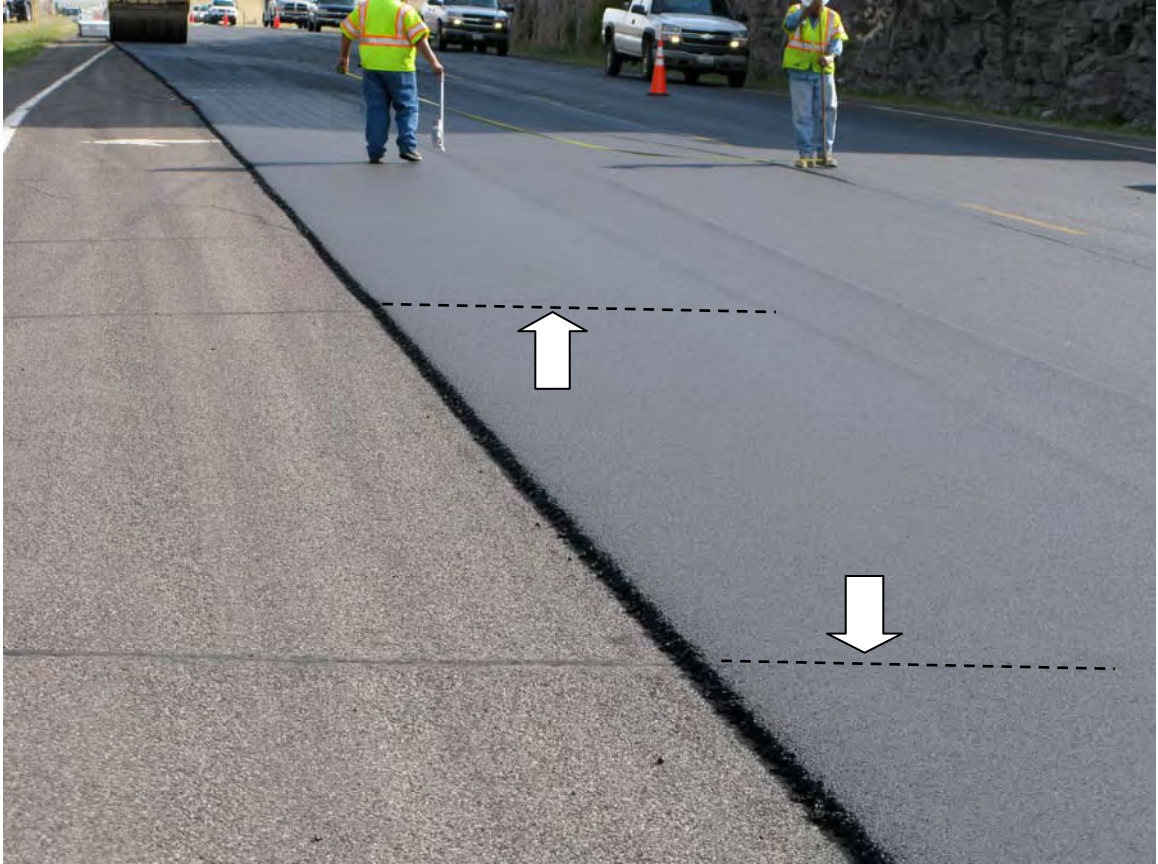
Bumps and Transverse Cracks Over Cracks 129, 130 and 131 Northbound
